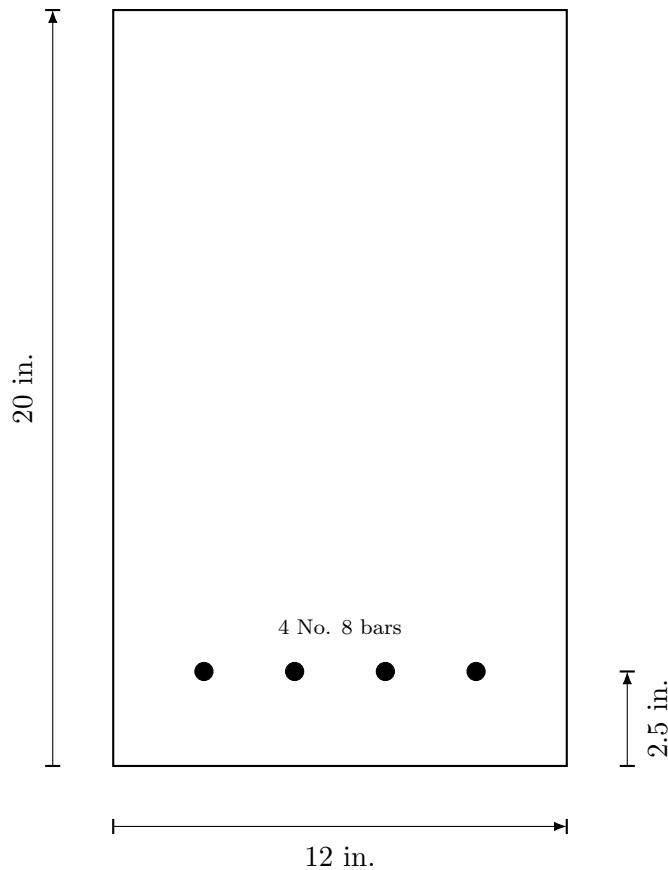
Beam cross-section used in Example 4-1 (redrawn from the provided image).
